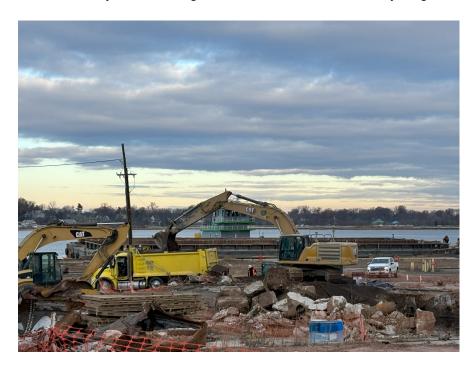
View of trucking activities in Excavation 11, IRM 1 Central Area, facing west.
